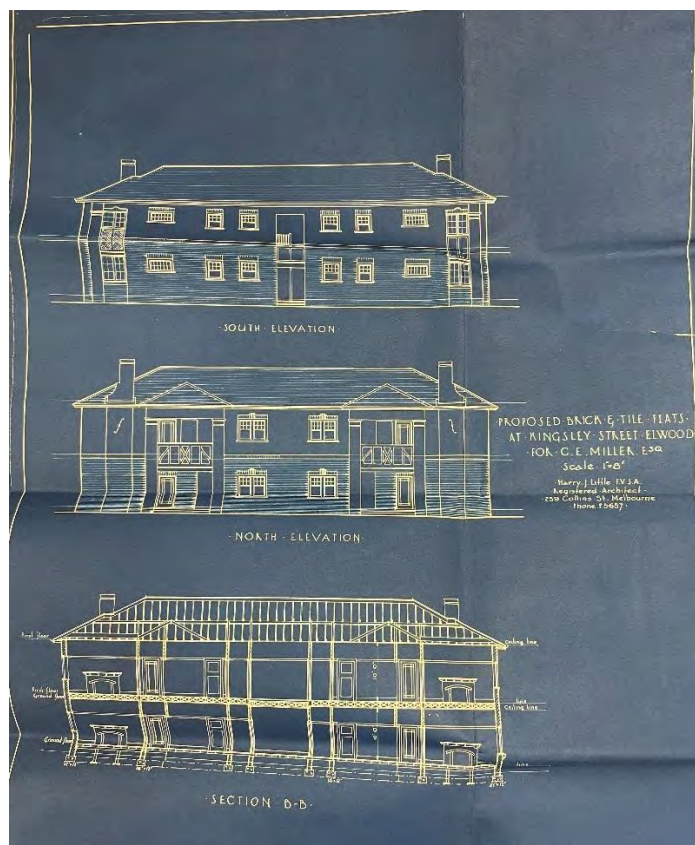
Proposed brick and tile roof flats at Kingsley Street, Elwood for C. E. Miller Esq (elevations and section). Source: Harry J Little. n.d. Drawings of 4-6 Kingsley Street, Elwood. Council Records. City of Port Phillip.
